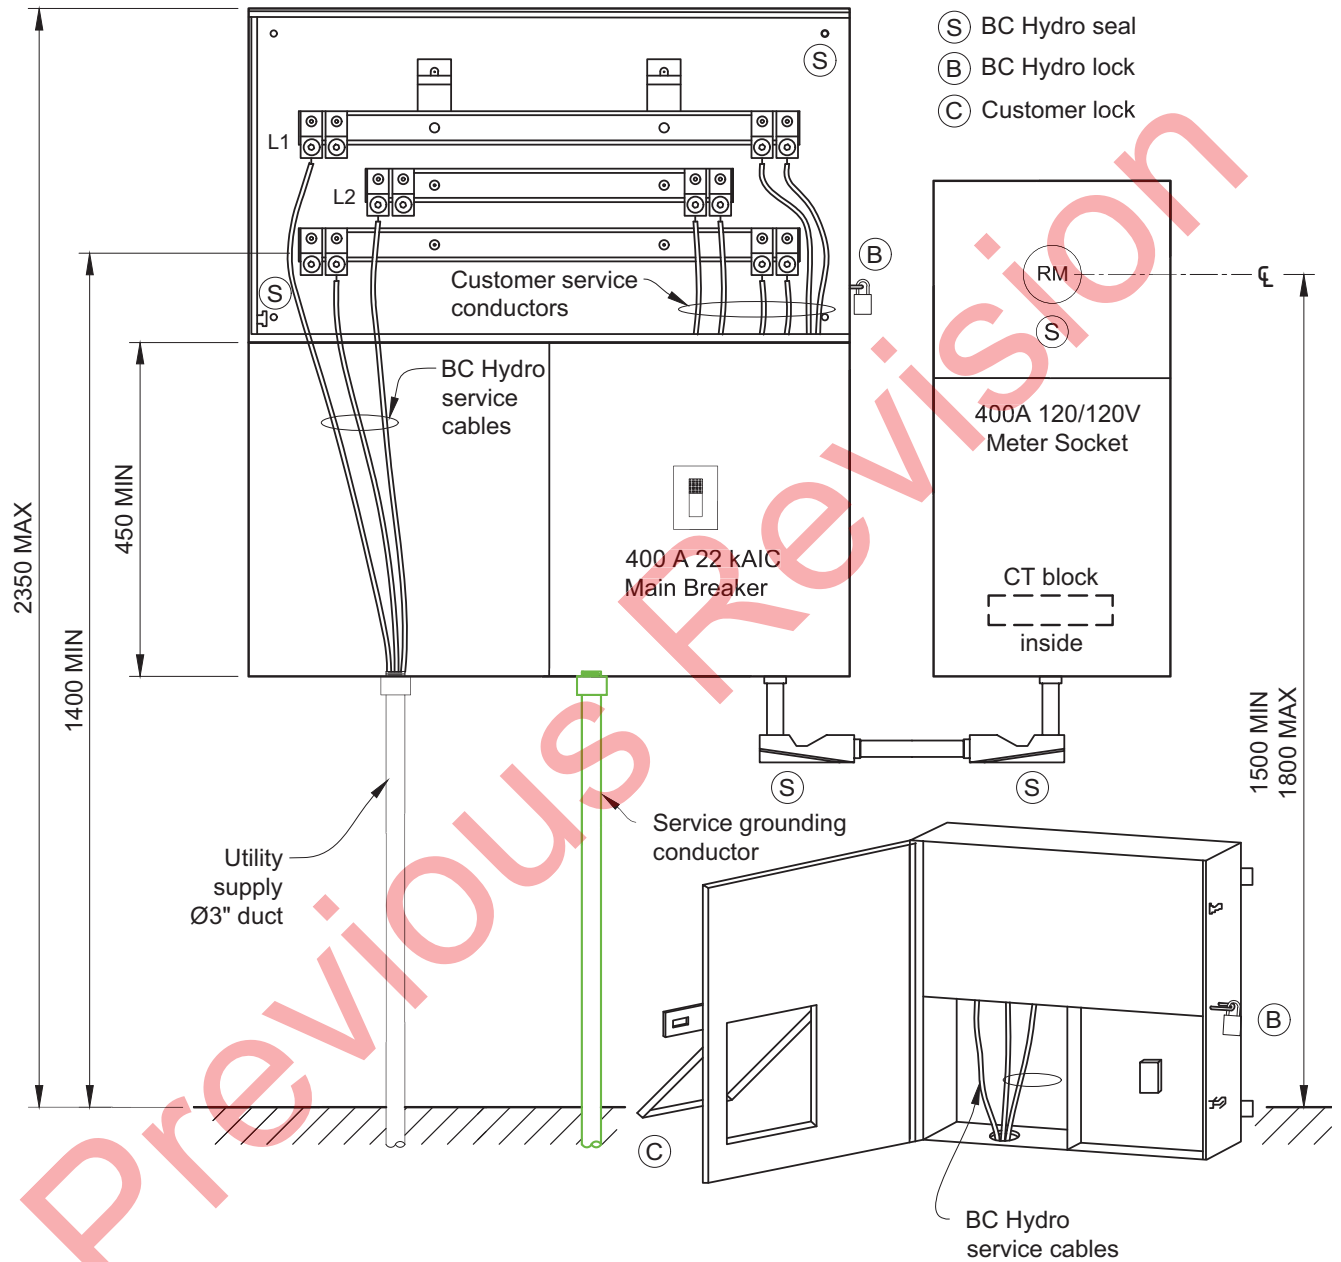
400 A service assembly using 3R outdoor-type enclosure
